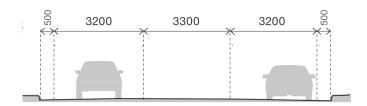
Lane arrangement Option 3 - Narrow traffic lanes with shoulders - preferred.
